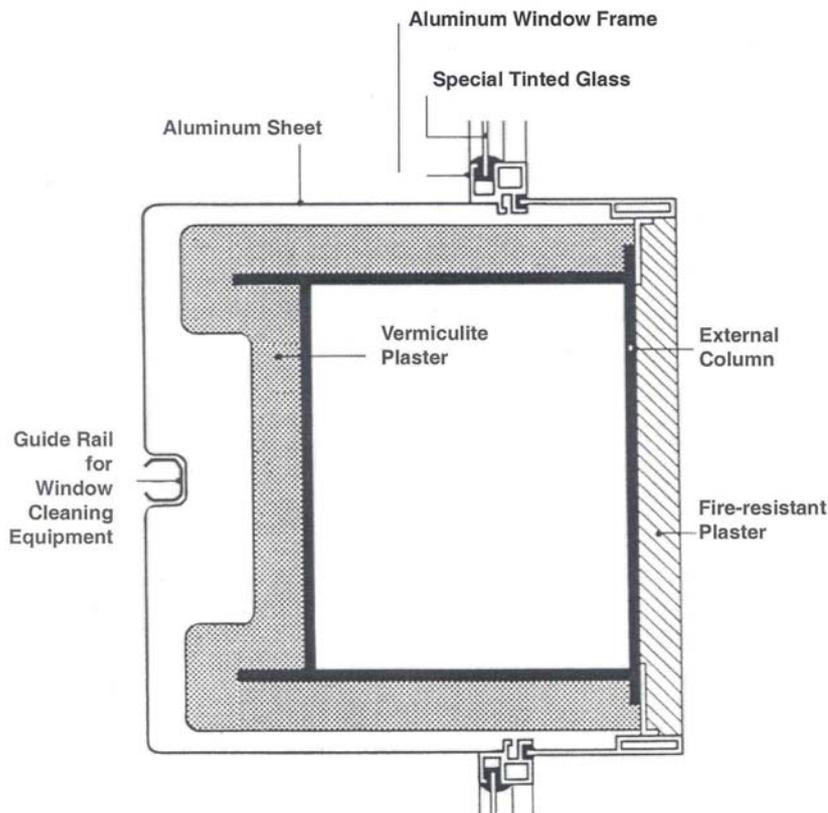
Fire Protection for typical Exterior Columns in Twin Towers
